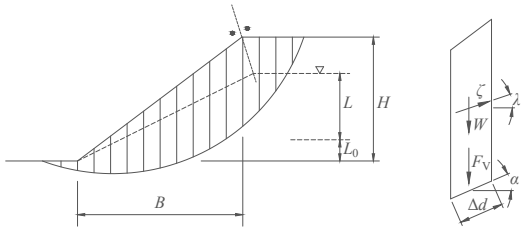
Cross section schematic of the slope geometry and slice parameters used in Section 4.2.
